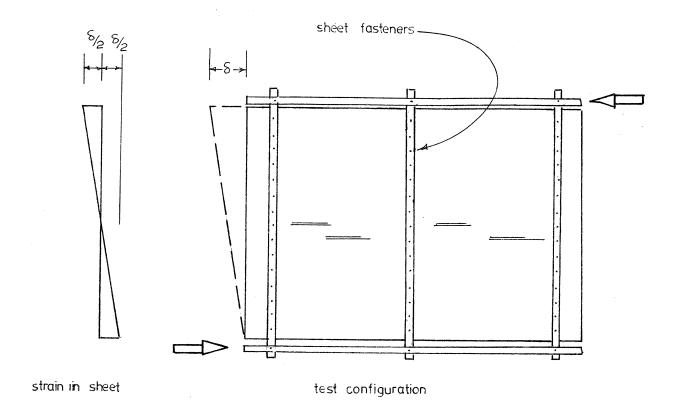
Deflected Shape and Strain Pattern in Assembled Roofing Test
